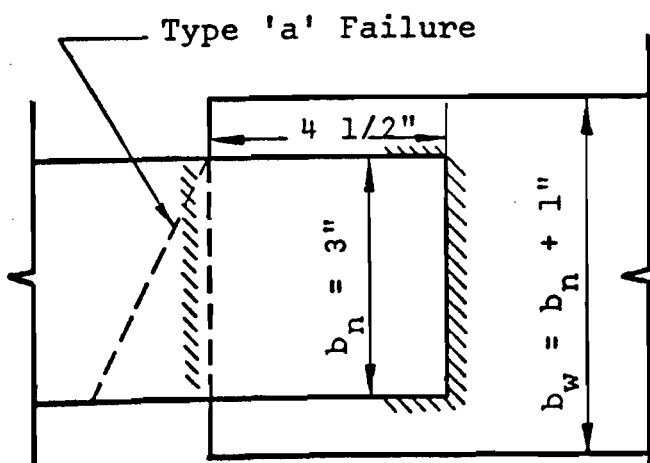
SINGLE LAP LONGITUDINAL FILLET WELD CONNECTION.
